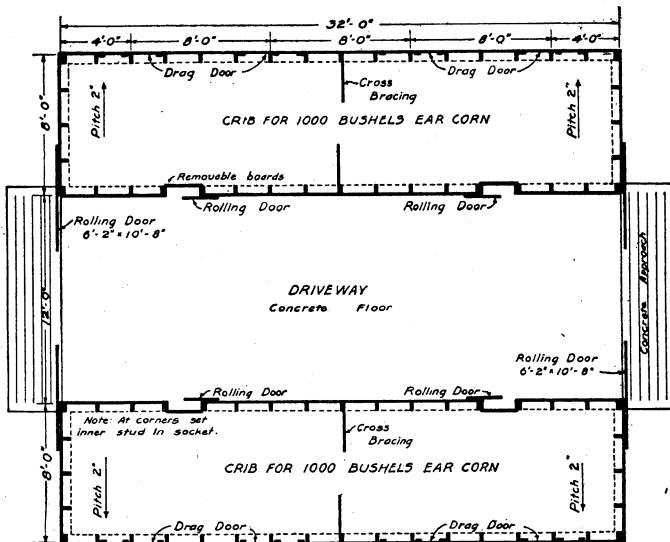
Floor plan of rat-proof cornercrib shown in figure 3.
